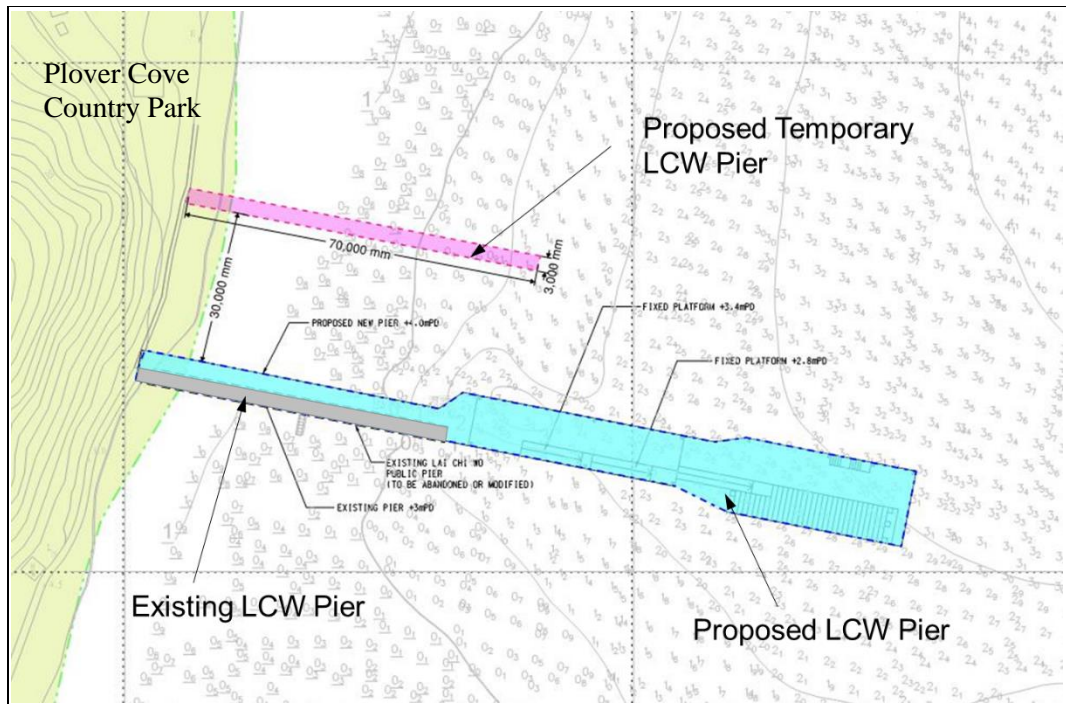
Location of Proposed LCW Pier and Proposed Temporary LCW Pier
